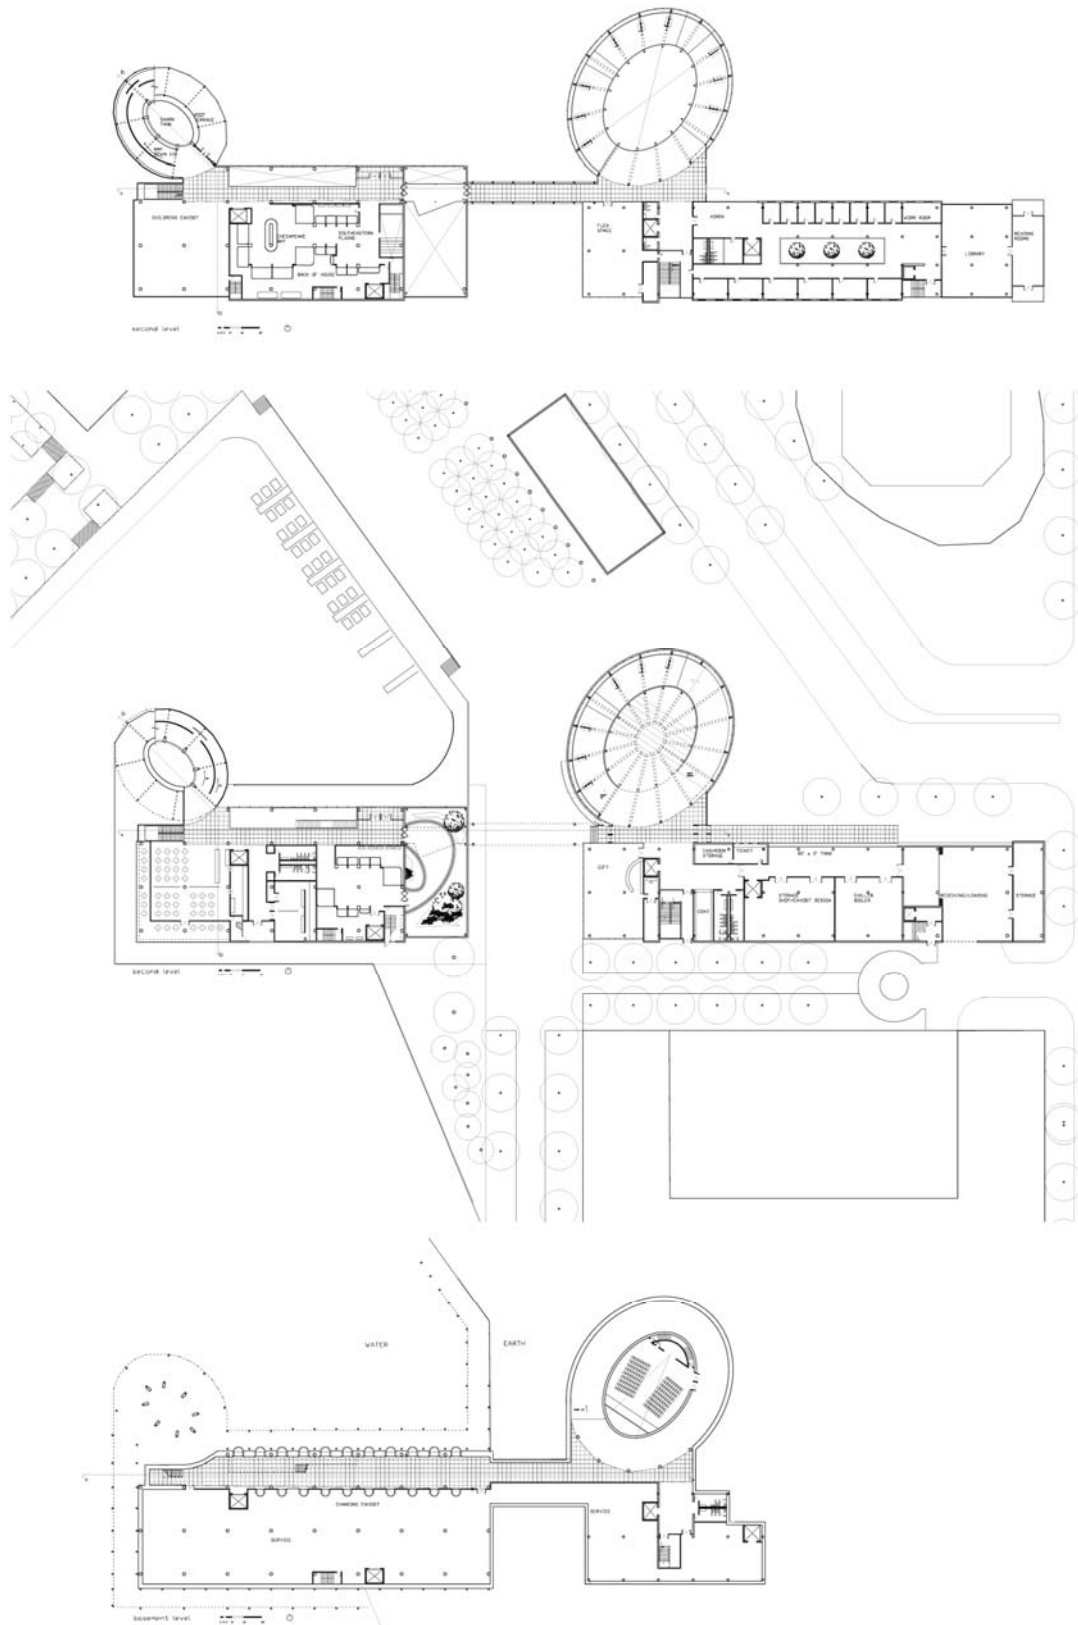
2nd floor plan, ground floor plan, basement floor plan (from top).
